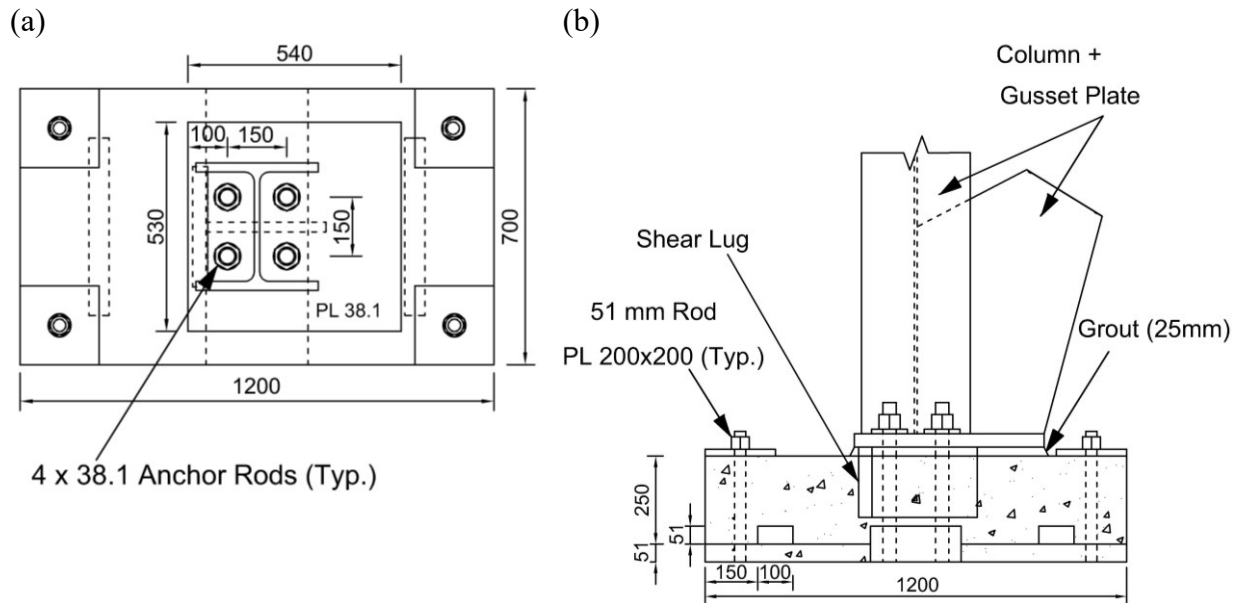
Column base plate and concrete footing details (Specimen 1 shown): (a) Plan view; (b) Elevation view (dimensions in mm).
